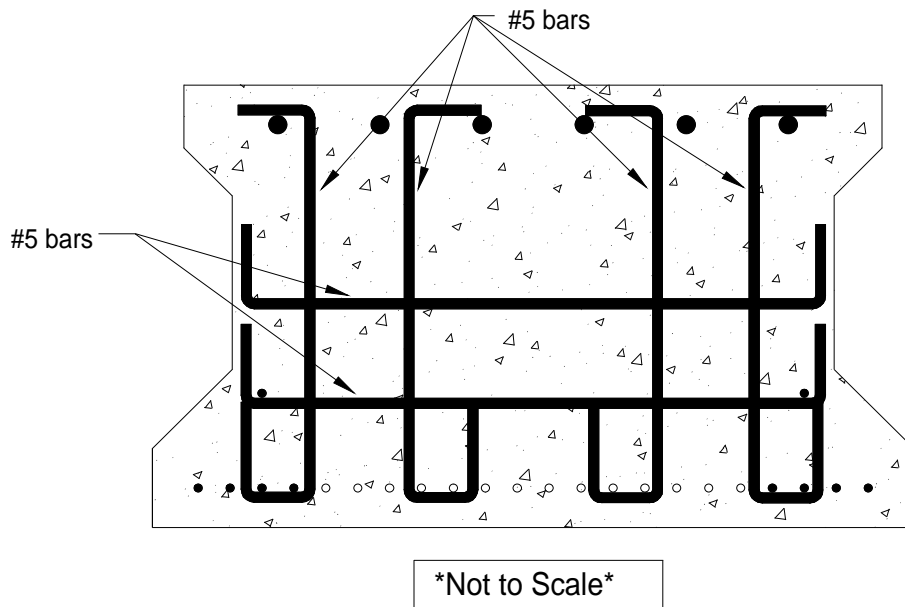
Diagonal Reinforcement at 4½ in. and 10½ in. from End Face
